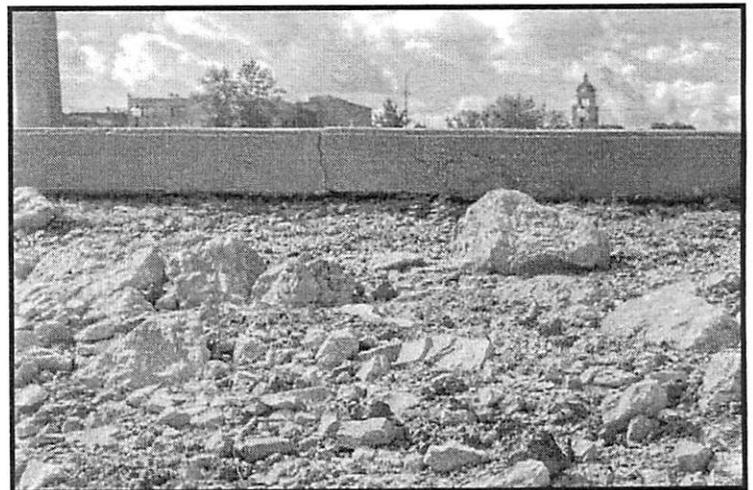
Erosion Beginning to Undermine Harbor Sidewalk
